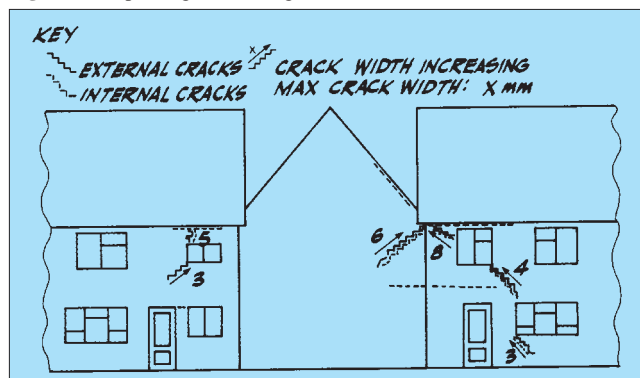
Category 2 subsidence damage studs are used to monitor crack width
